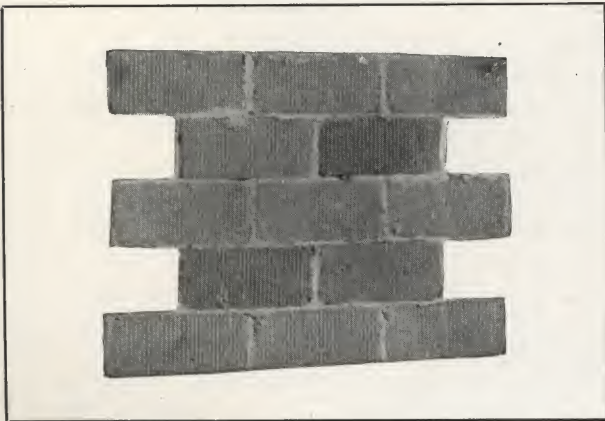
Concrete building tile are extensively employed as a backing for stucco finishes.
